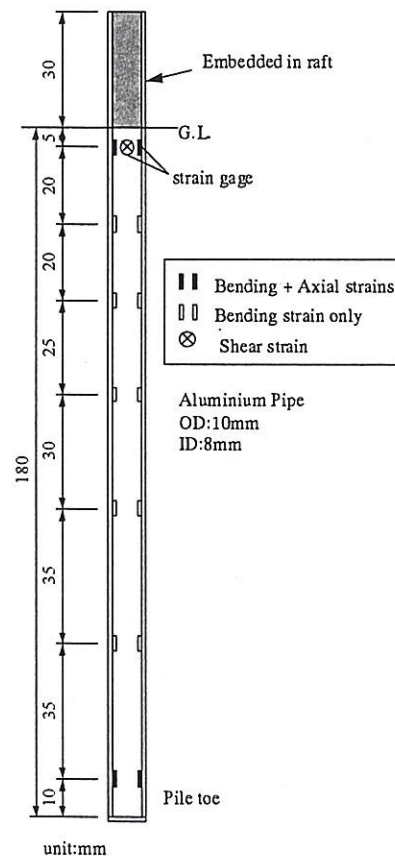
Details of model pile used raft with rigid pile head connection
